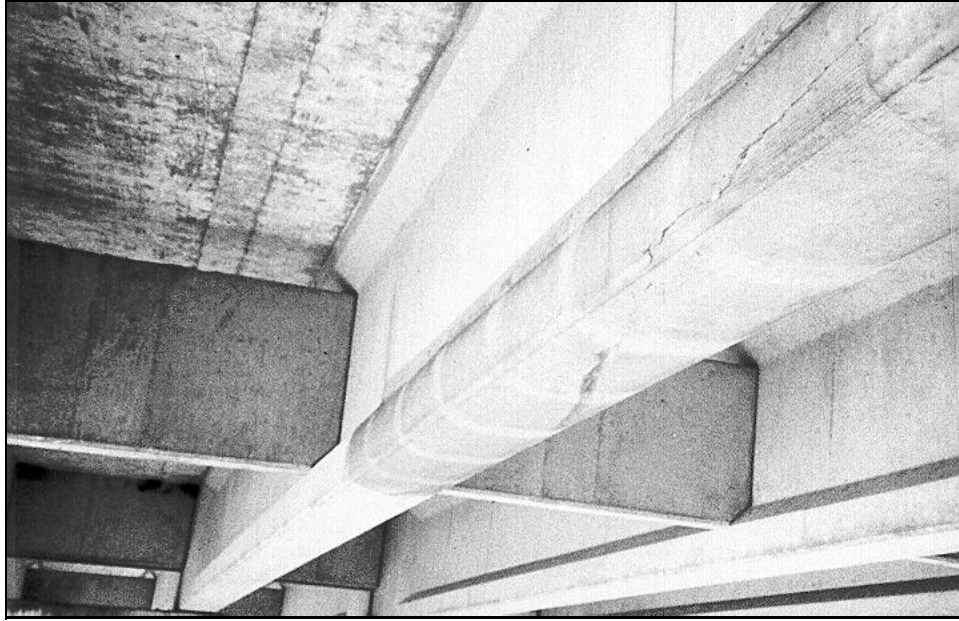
6 Concrete damage where the diaphragm acts as a reaction for transverse impact loading
